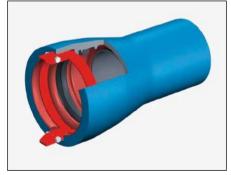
The BLS®/VRS®-T friction locking push-in joint with a clamping ring
